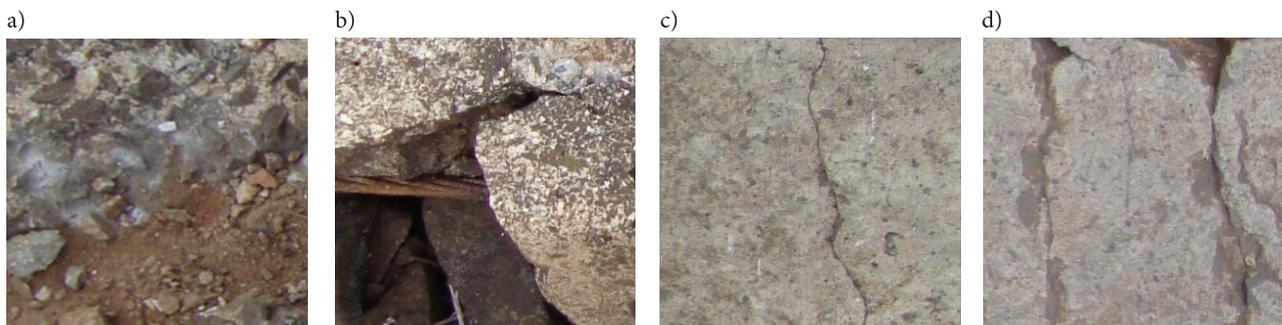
Examples of faults to concrete sleepers: a) loss, b) loss, with visible reinforcement of concrete, c) crack, d) double crack [photo. authors]
